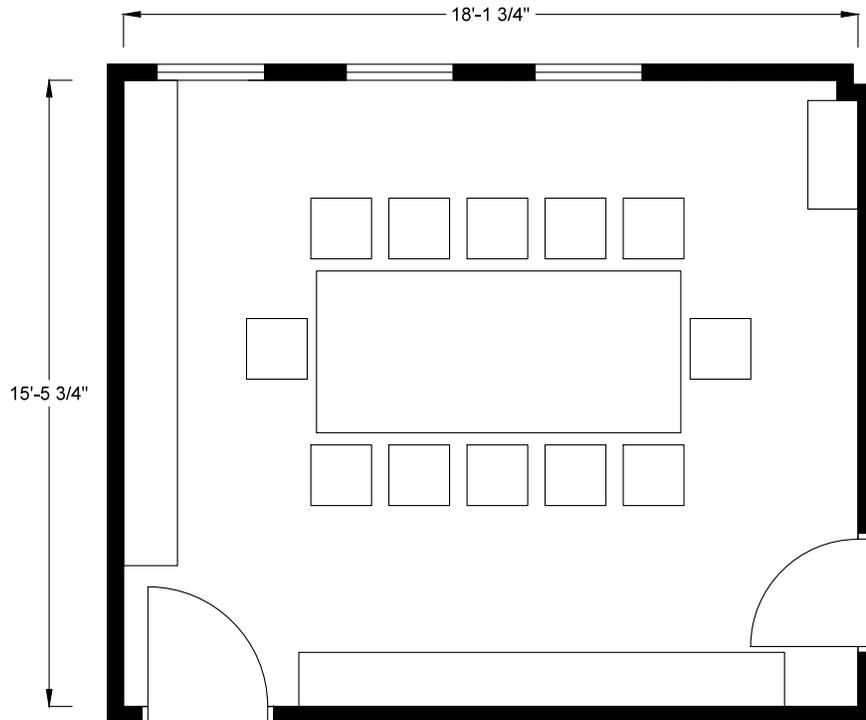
Plan of existing CREEES classroom. Diagram by author.
